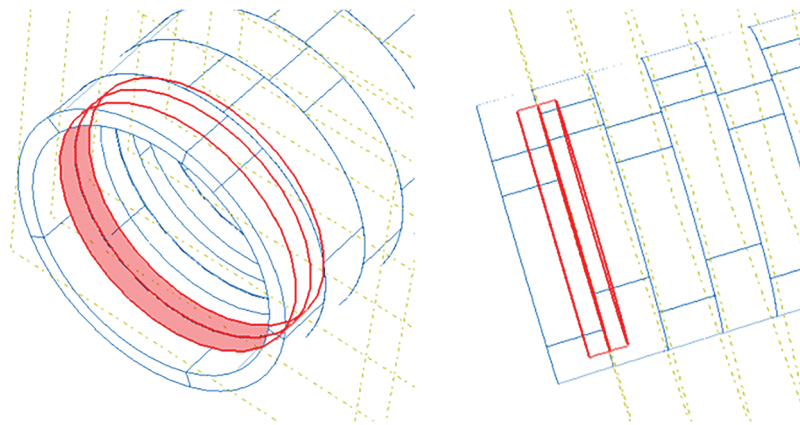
Reinforcement of steel plates spanning circumferential joints.
